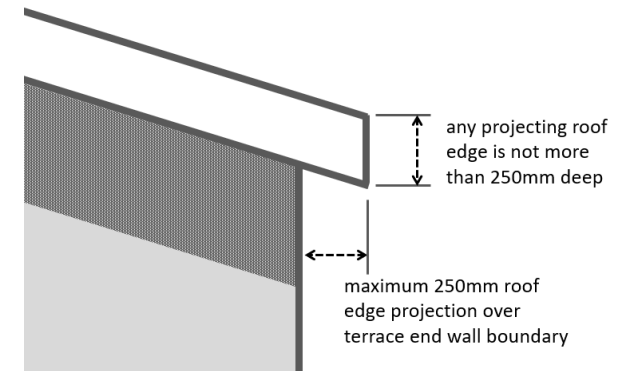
Diagrammatic elevation illustrating maximum projection at a terrace end wall, and the maximum depth of any projecting roof edge
